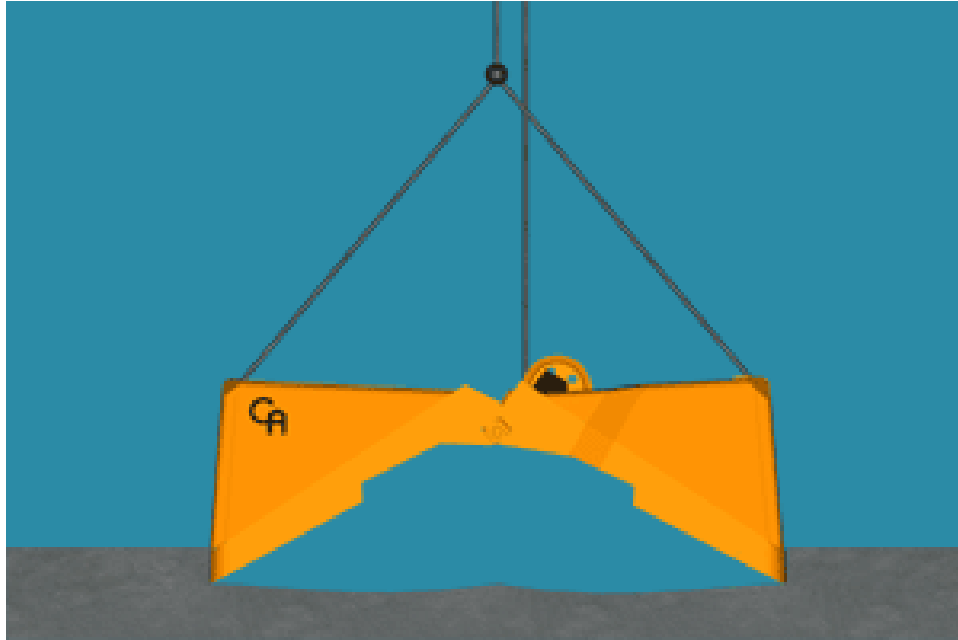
General level cut bucket excavation profile (Source: Cable Arm).
